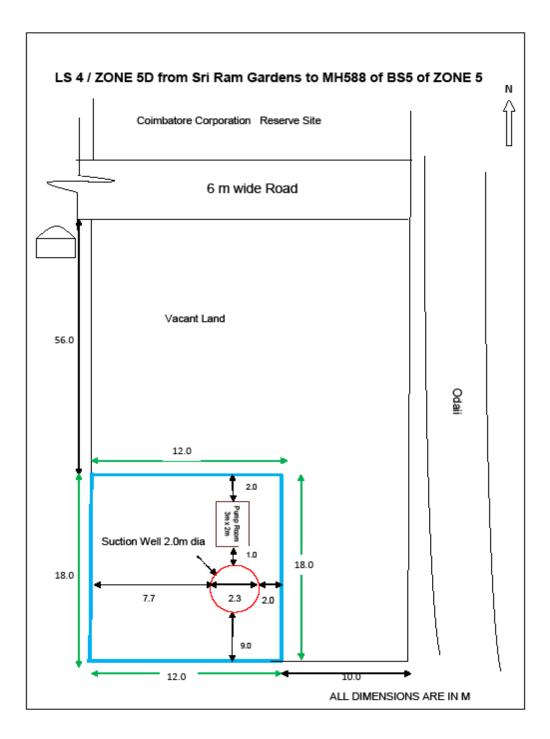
Site Set out Plans – Zone V (Sri Ram Gardens)
